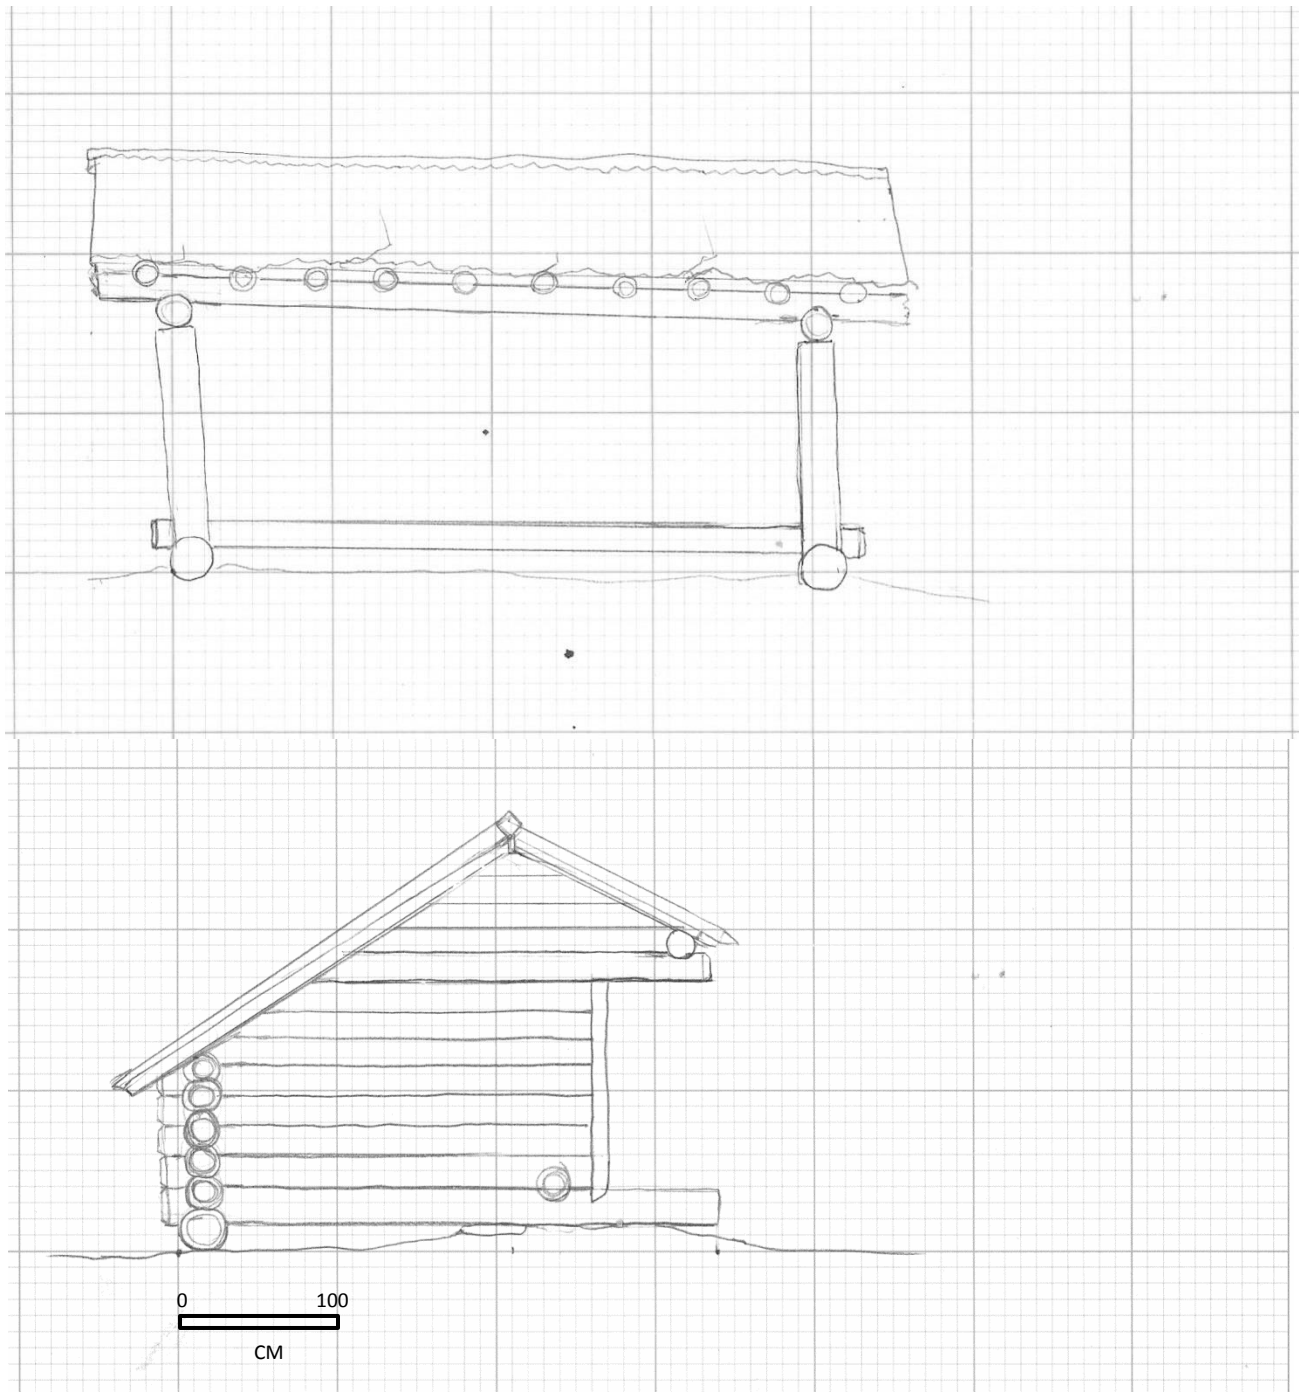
Mount Langdon shelter drawings. Above: East (front) elevation. Below: South side elevation. October 3, 2011.
